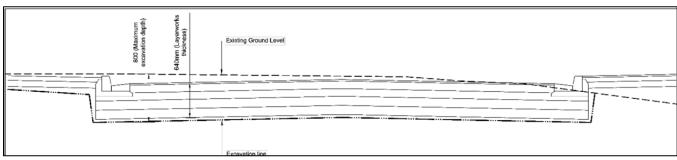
EXCAVATION FOR ROAD LAYERWORKS AT DEPTH (SOURCE: WALTERS, 2020)
